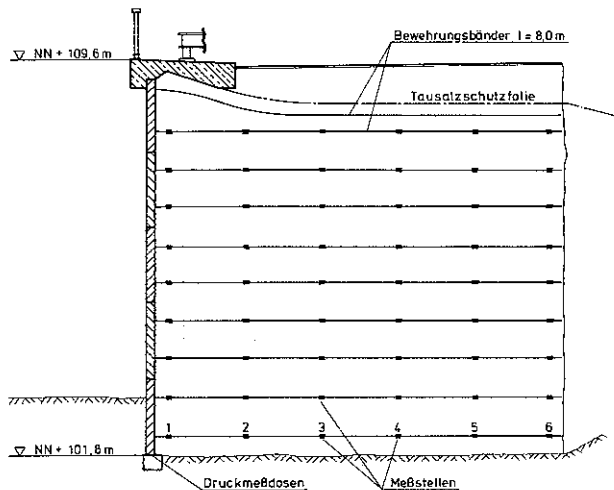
Cross section through the reinforced earth wall "Roedelheim"
